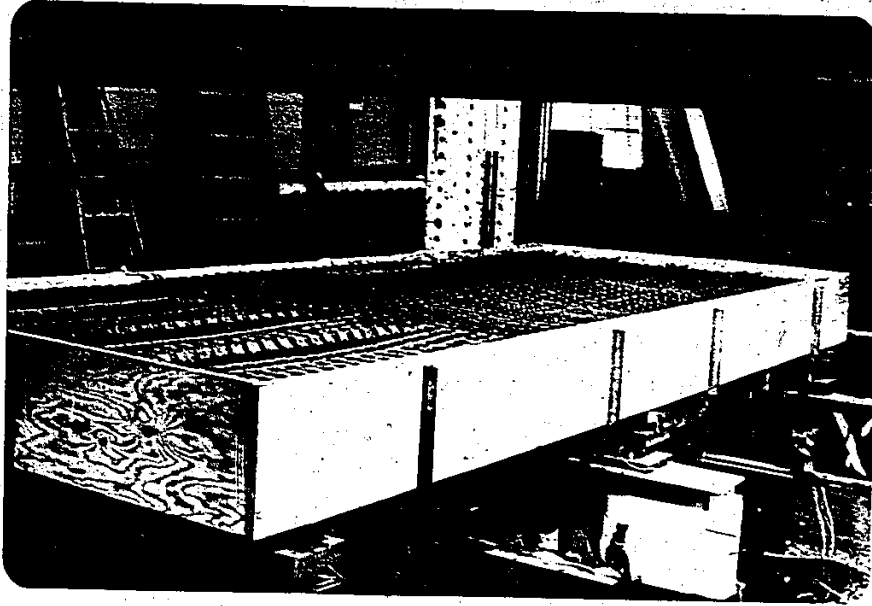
FORMWORK FOR THE CASTING OF THE REINFORCED CONCRETE SLAB, BRIDGE MODEL I.
